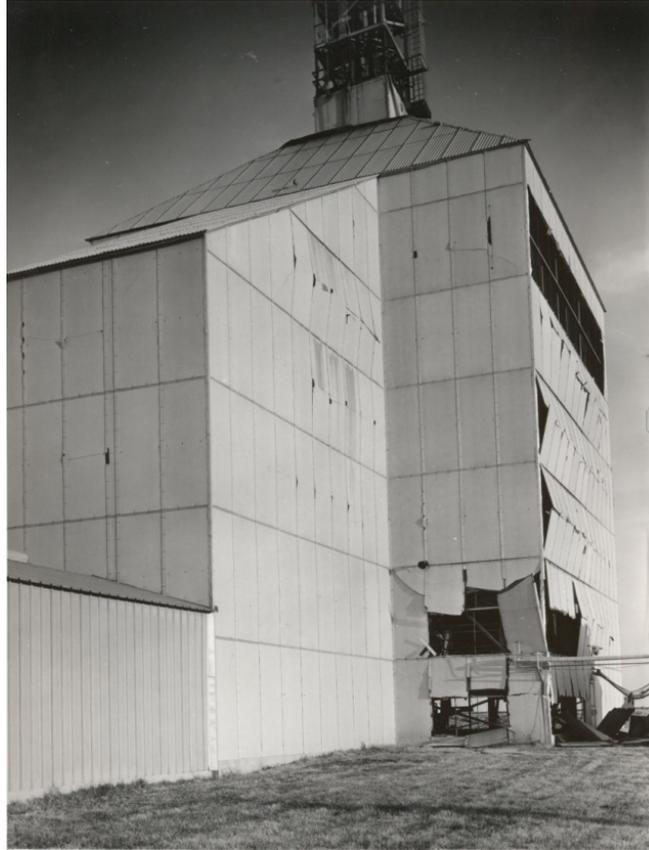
Damaged Aerobee Tower Enclosure at Wallops Island, 1964
